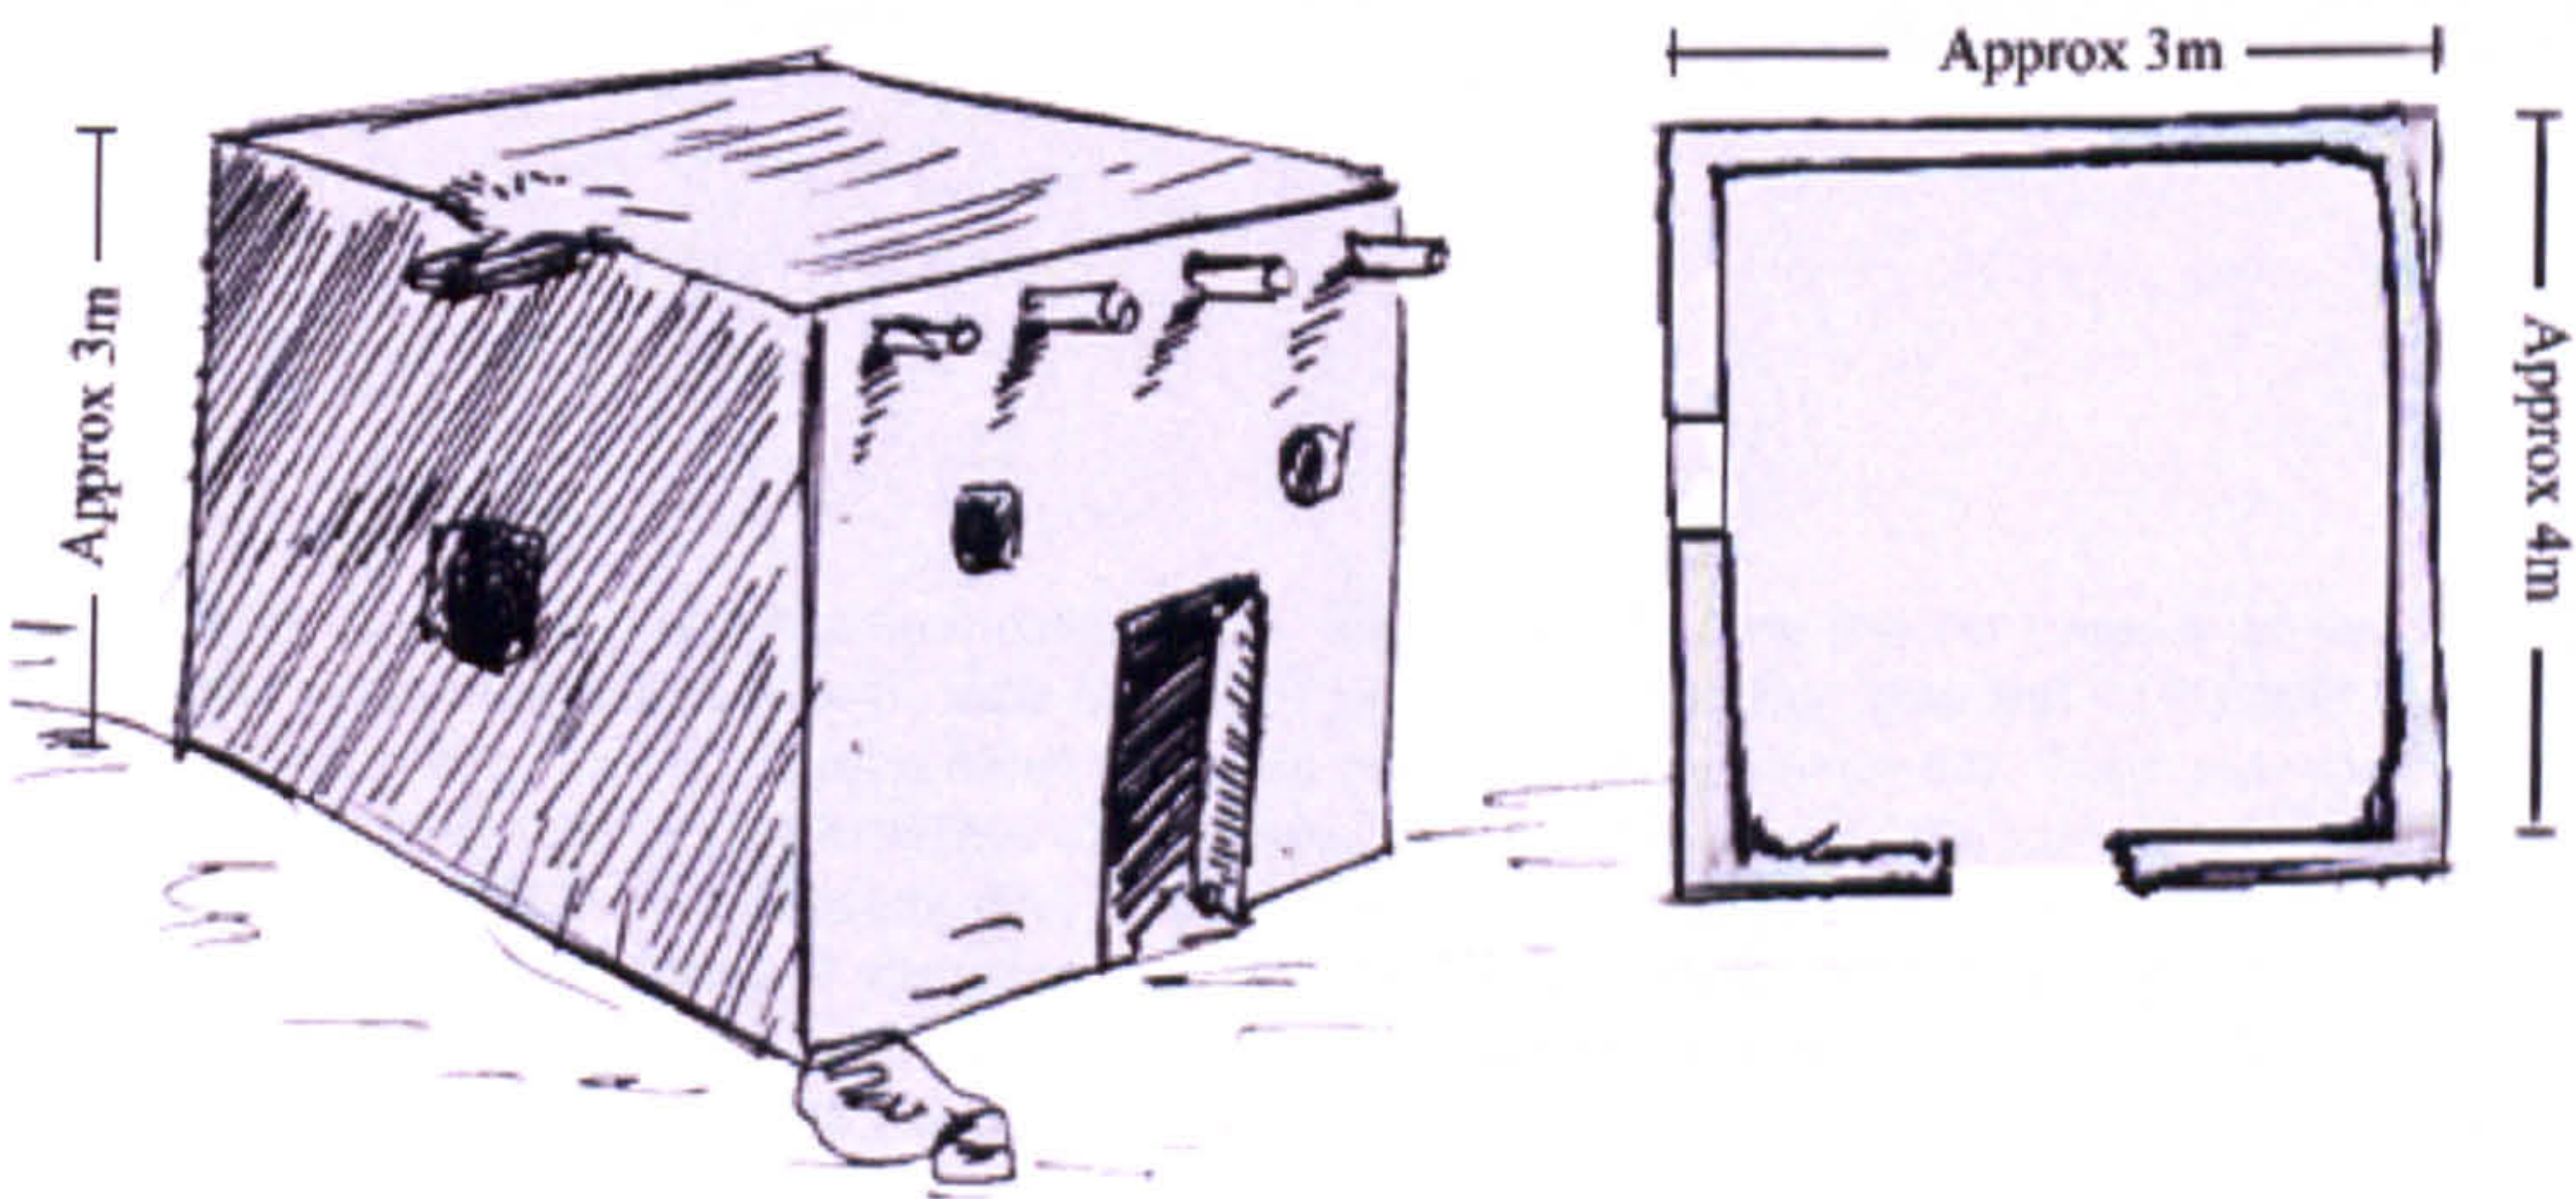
Plan of one-room house in a rural area of Quetta in Baluchistan. This kind of one-room house is popular and it can be found in different parts of Baluchistan. Source: Author
